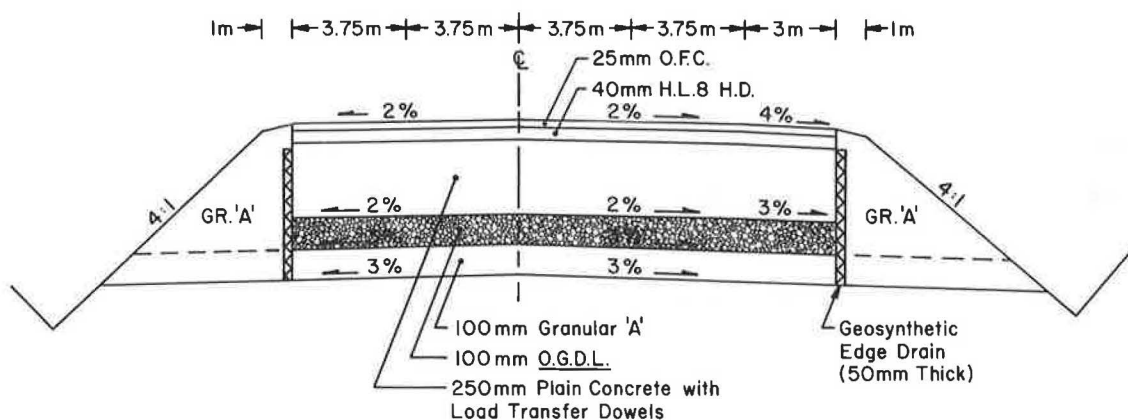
Example of highway pavement with open-graded drainage layer.
